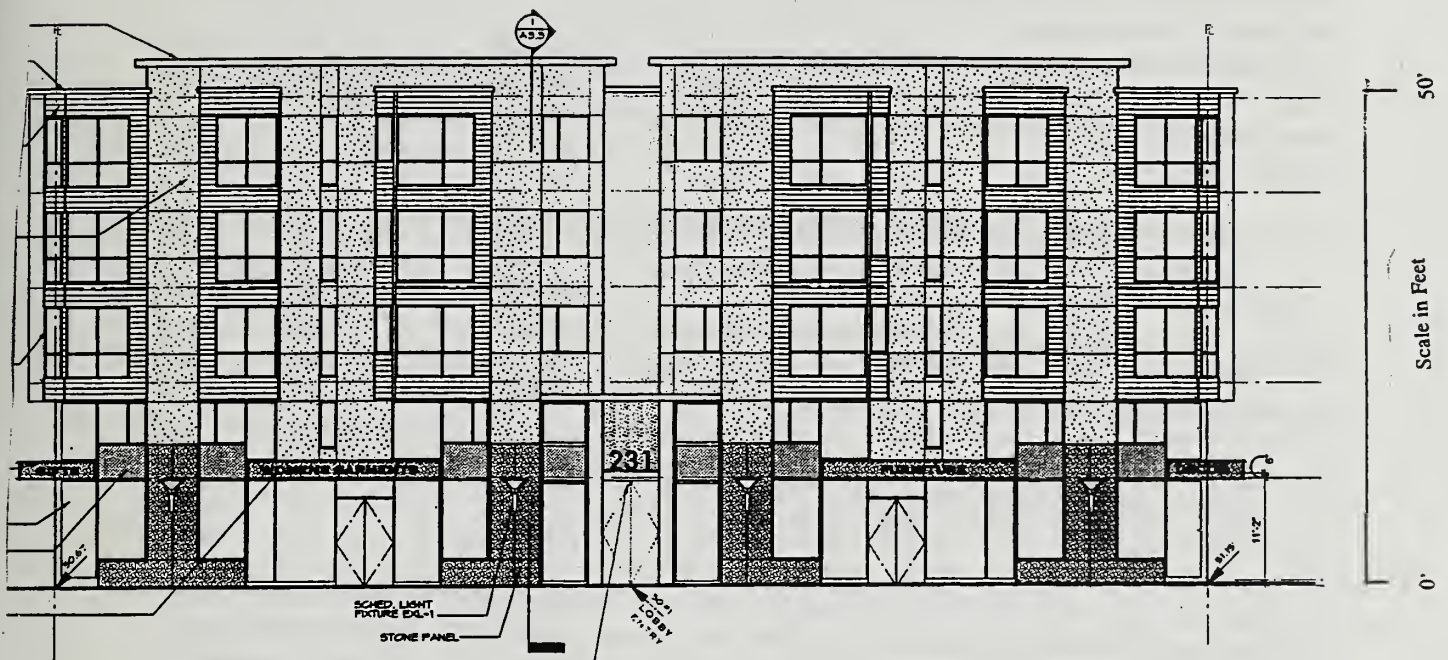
FRANKLIN STREET (EAST) ELEVATION
